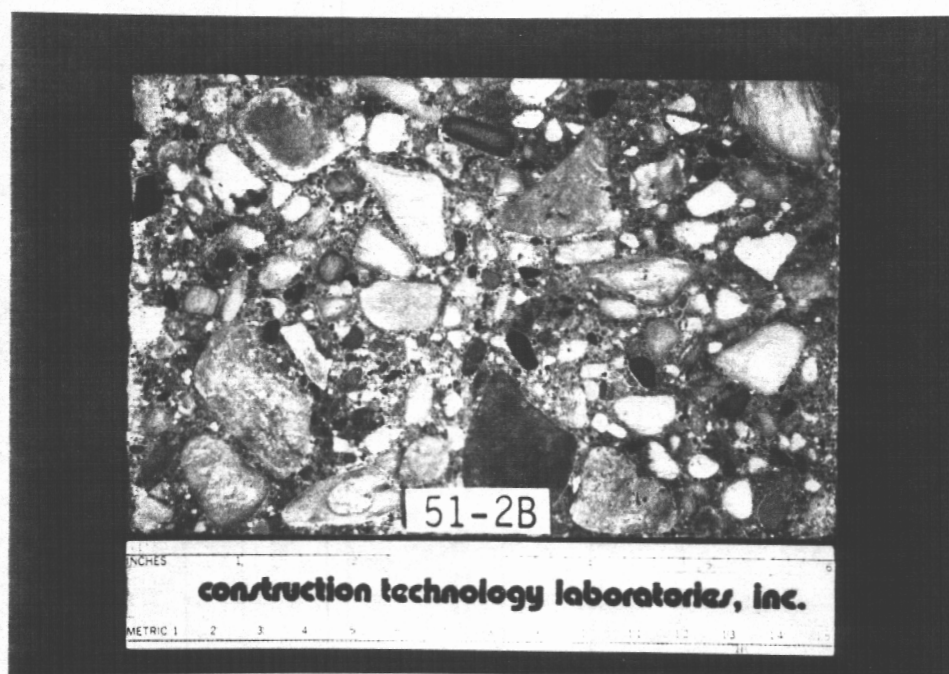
LAPPED SLICE SIDE OF CONCRETE SPECIMEN NO. 51-2B.
